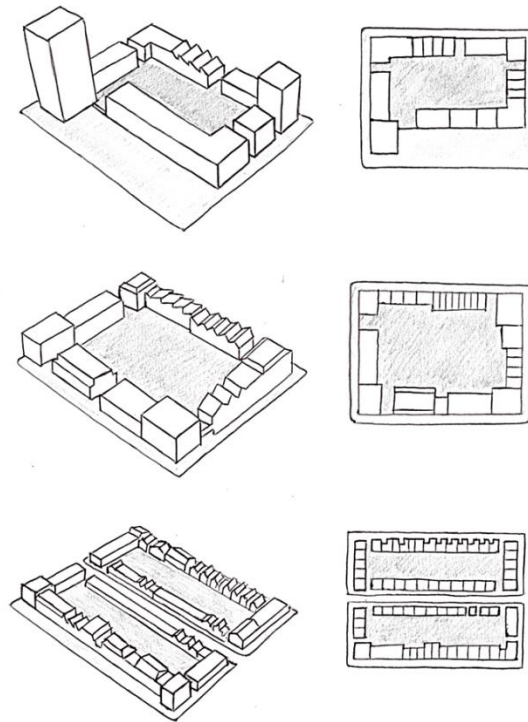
Three different combinations of building forms, layouts and densities on a single site
